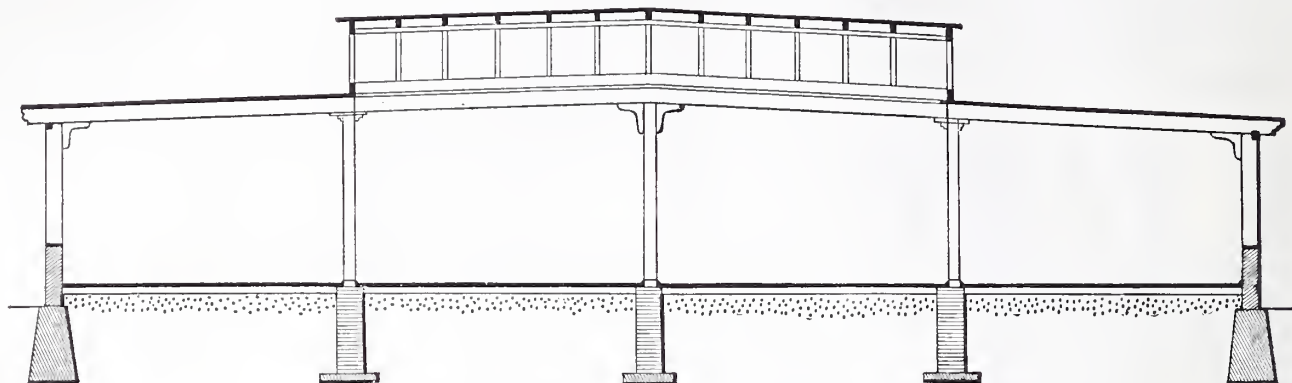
Section.—Scale, 1-16th Inch to the Foot.
